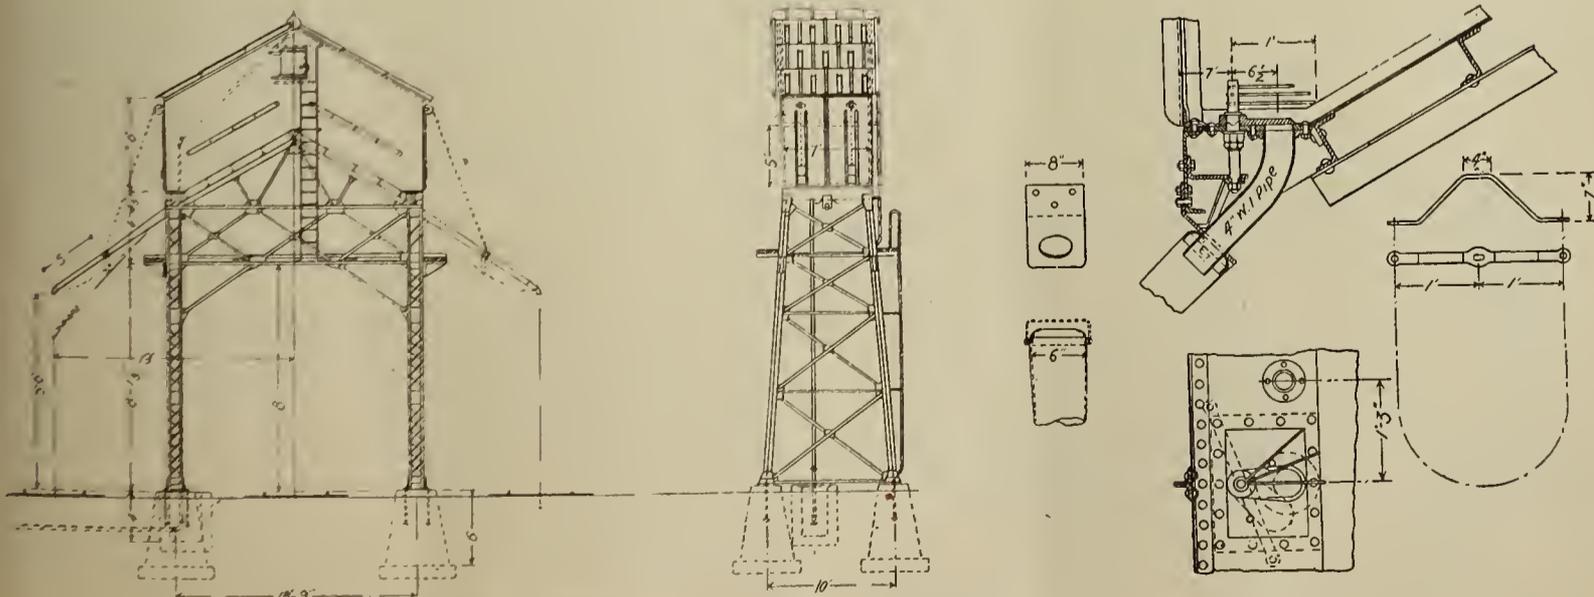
SAND TOWER AND DETAILS OF SAND VALVE—C., L. S. & E. RY.
